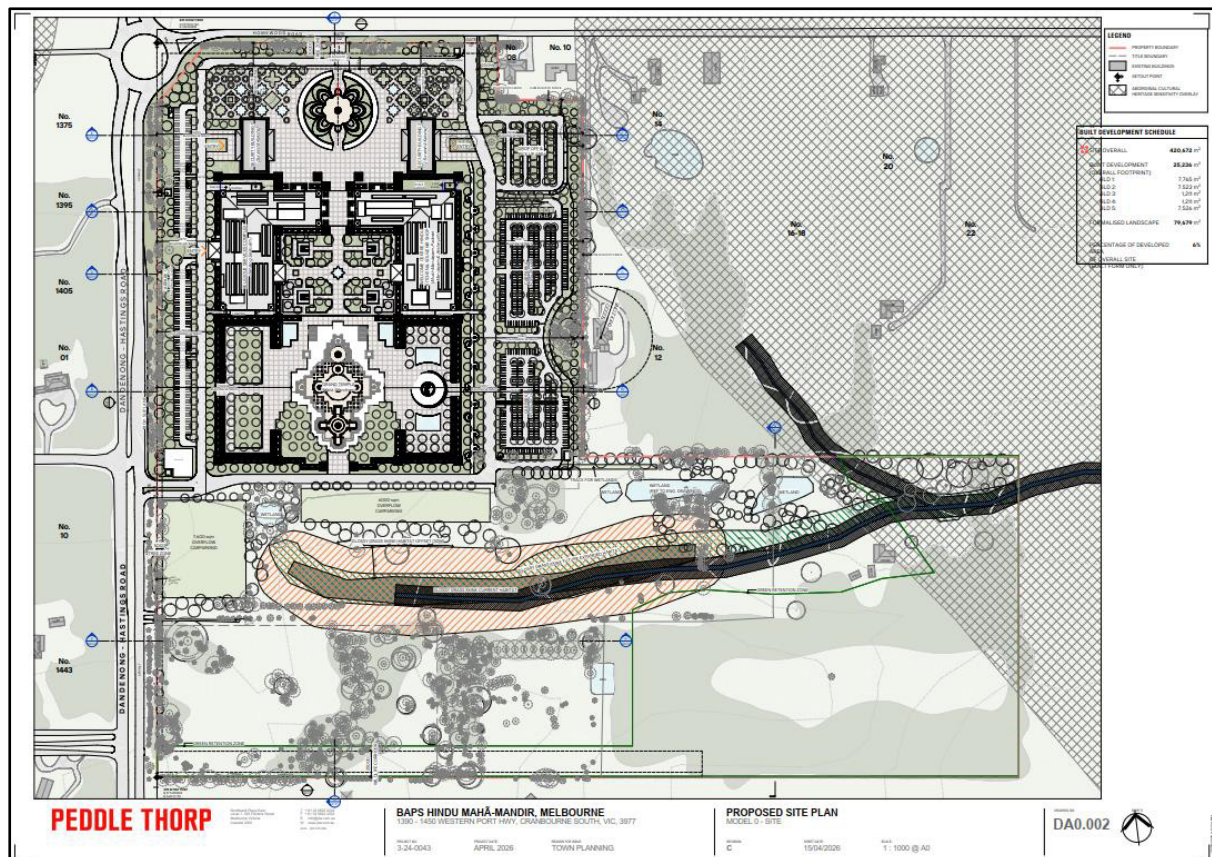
Proposed Development Plan (Source: Peddle Thorp Project 3-24-0043 DA0.002)
